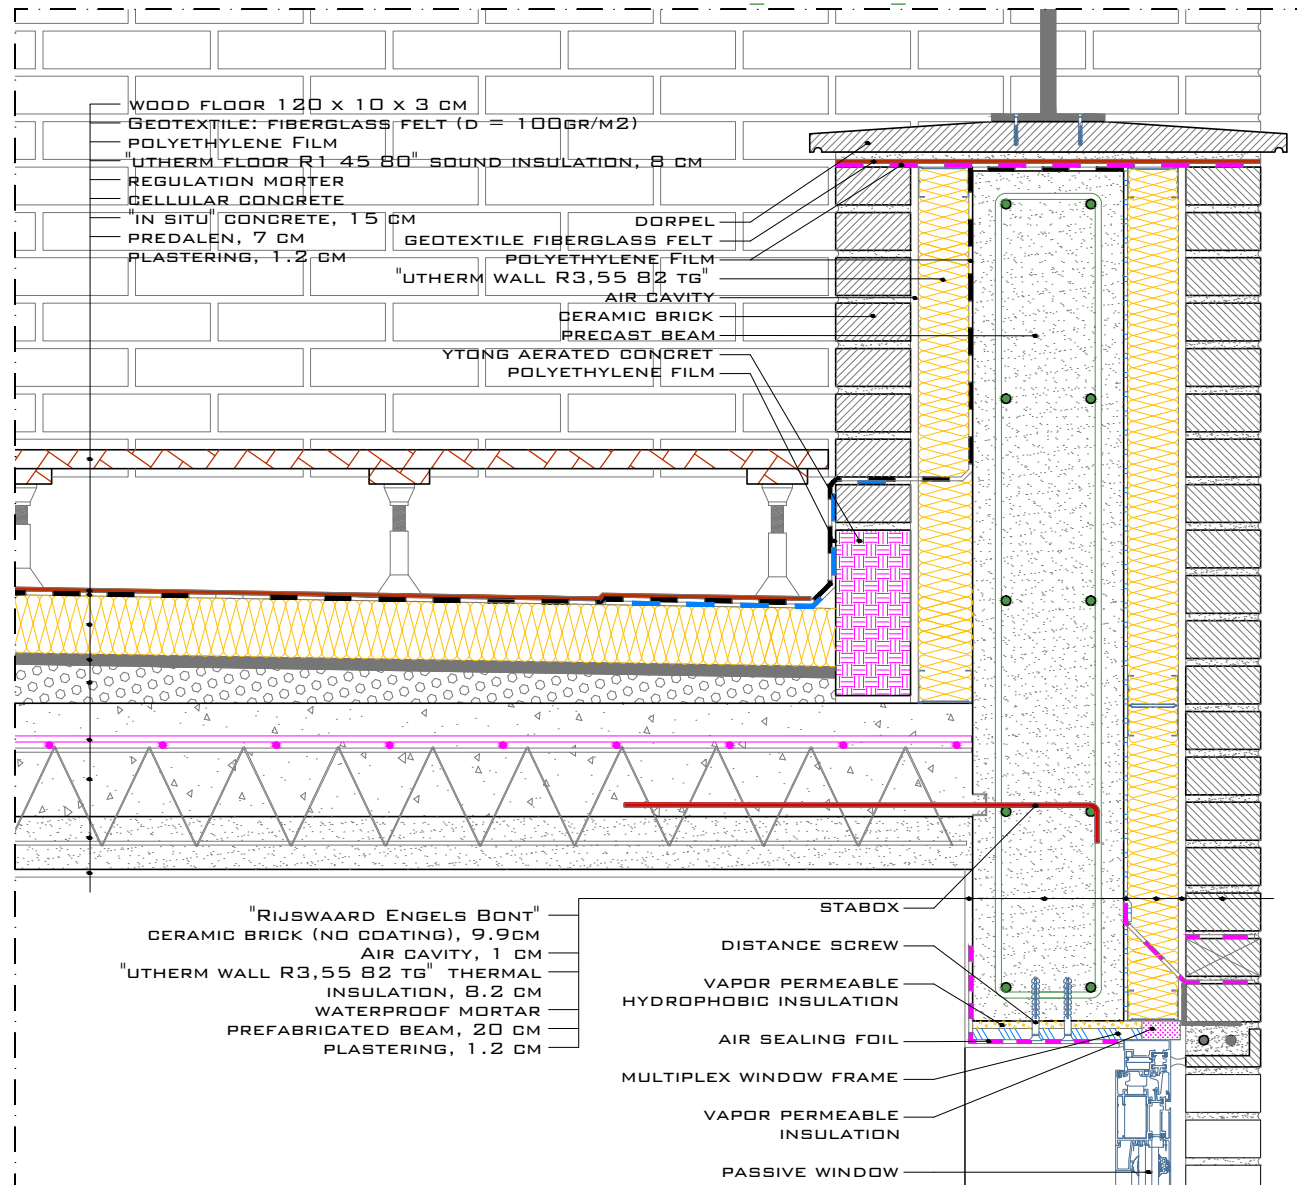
UNION TERRACE-TERRACE-FACADE\_S: 1/10
